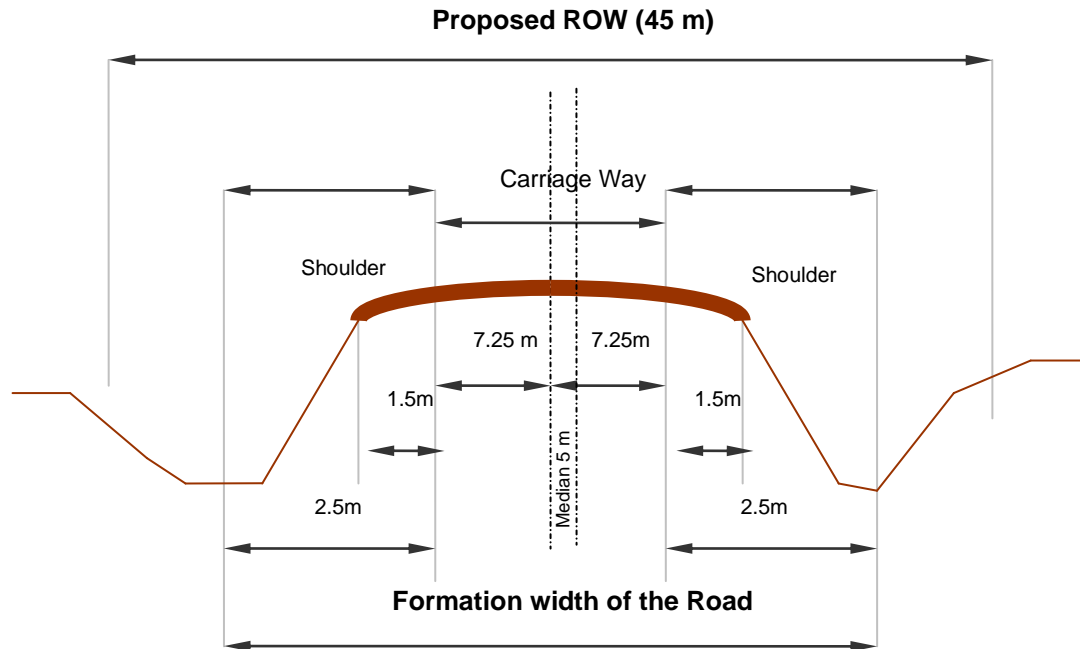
A cross section showing a typical Formation width of the Bypass Road
